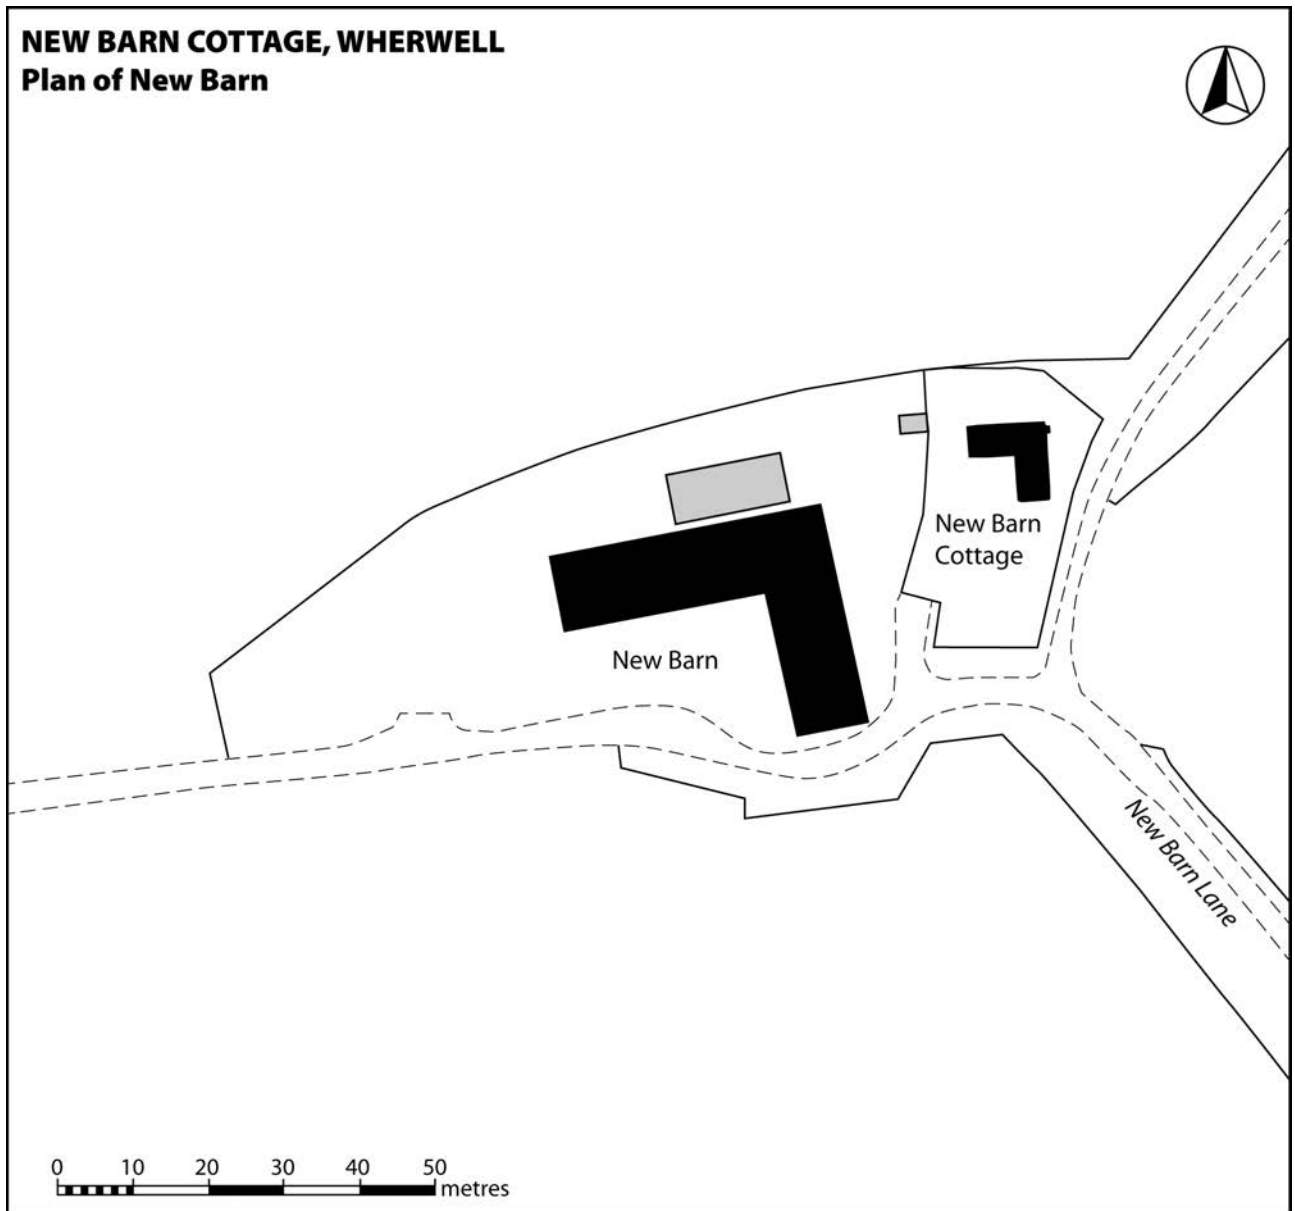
Location plan of New Barn Cottage in relation to New Barn.
